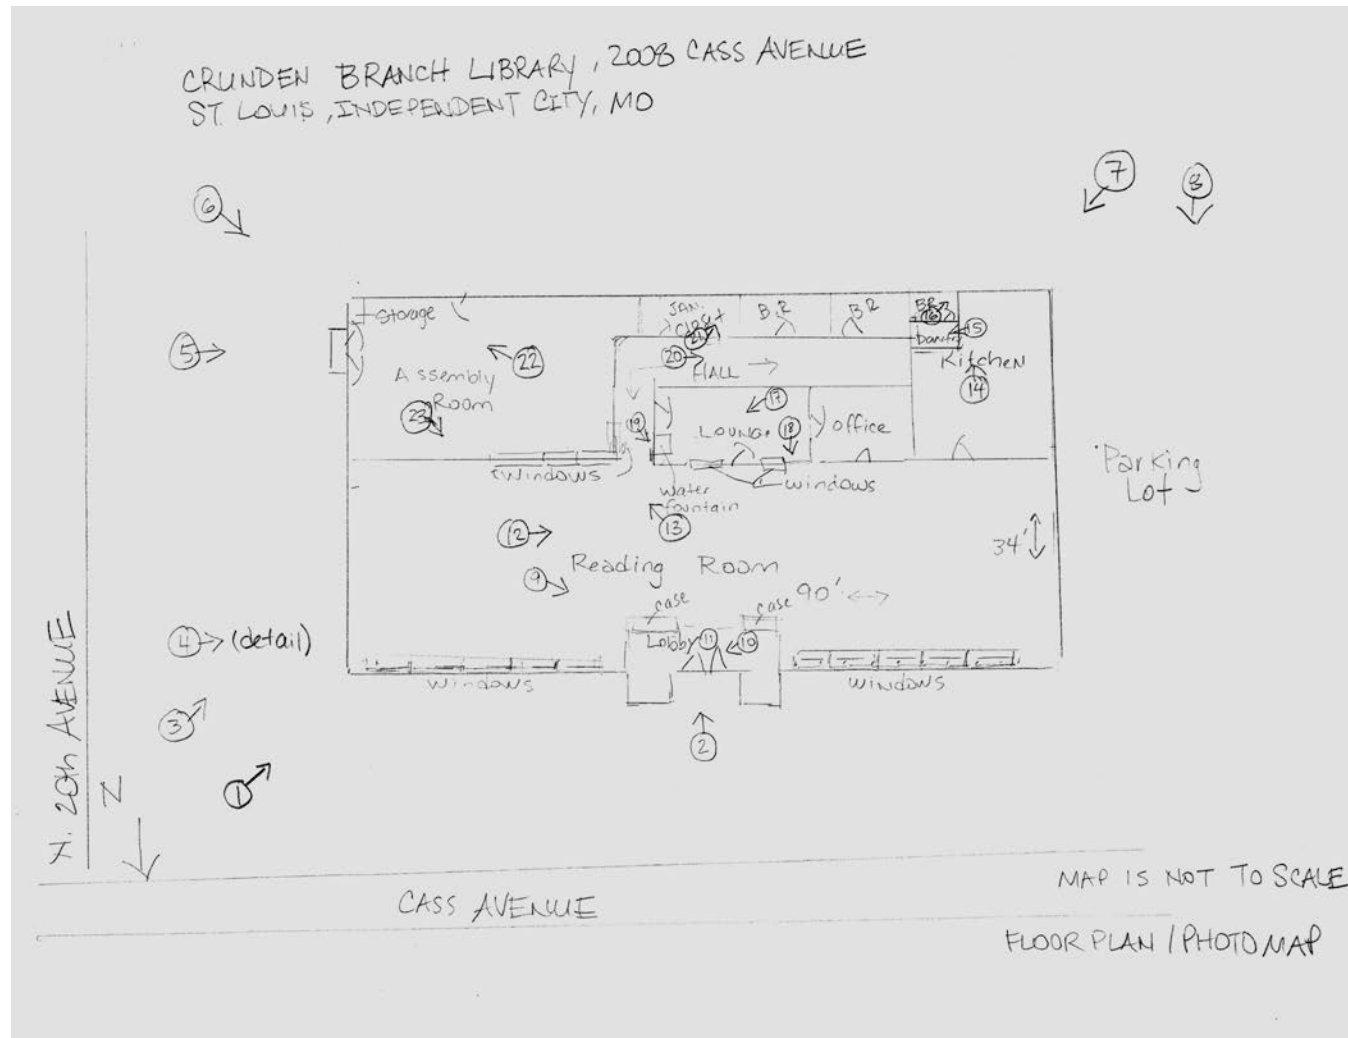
Floor Plan and Photo Log, Crunden Branch Library. Not to scale.
